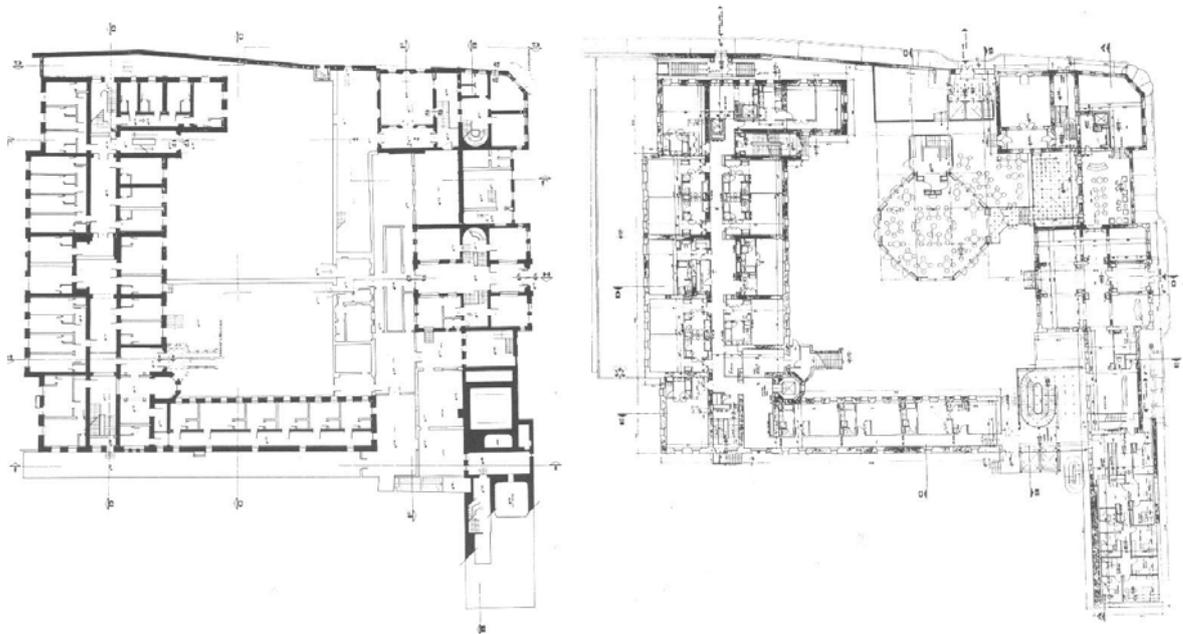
Ground Floor relevé and proposal plan (Özüekren 1987, p.99)
